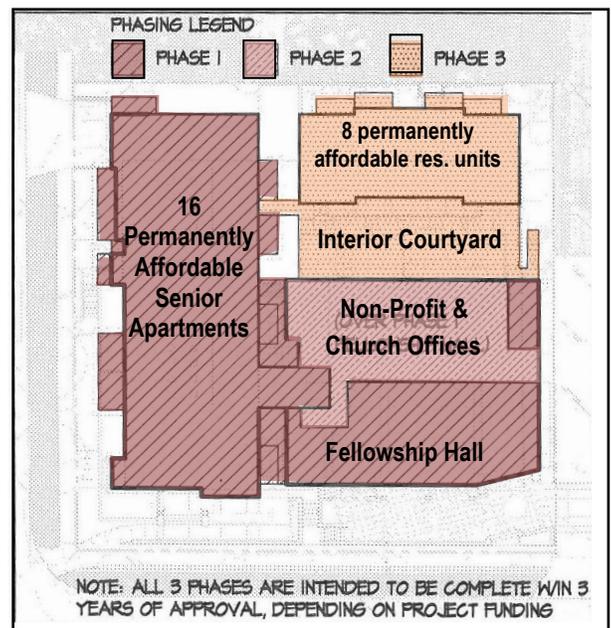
Proposed Phasing Plan (excerpt from sheet A1.00 of Plan Set for the Proposed Project)
